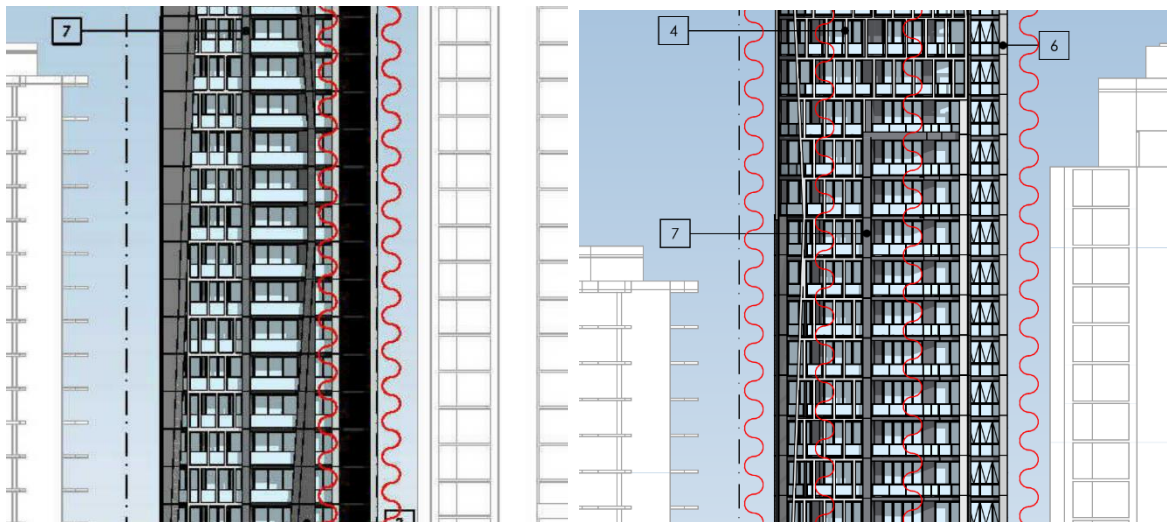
Approved façade screening (left) and proposed deletion of façade screening (right).
